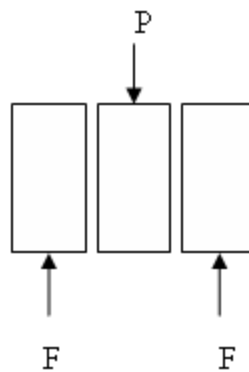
The Scheme showing Triplet Test for determining the initial shear strength of masonry
